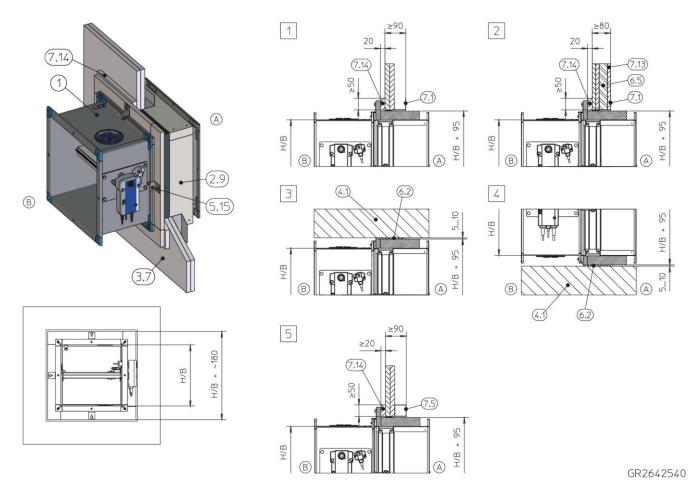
Dry mortarless installation into a shaft wall with metal support structure, with installation kit ES
